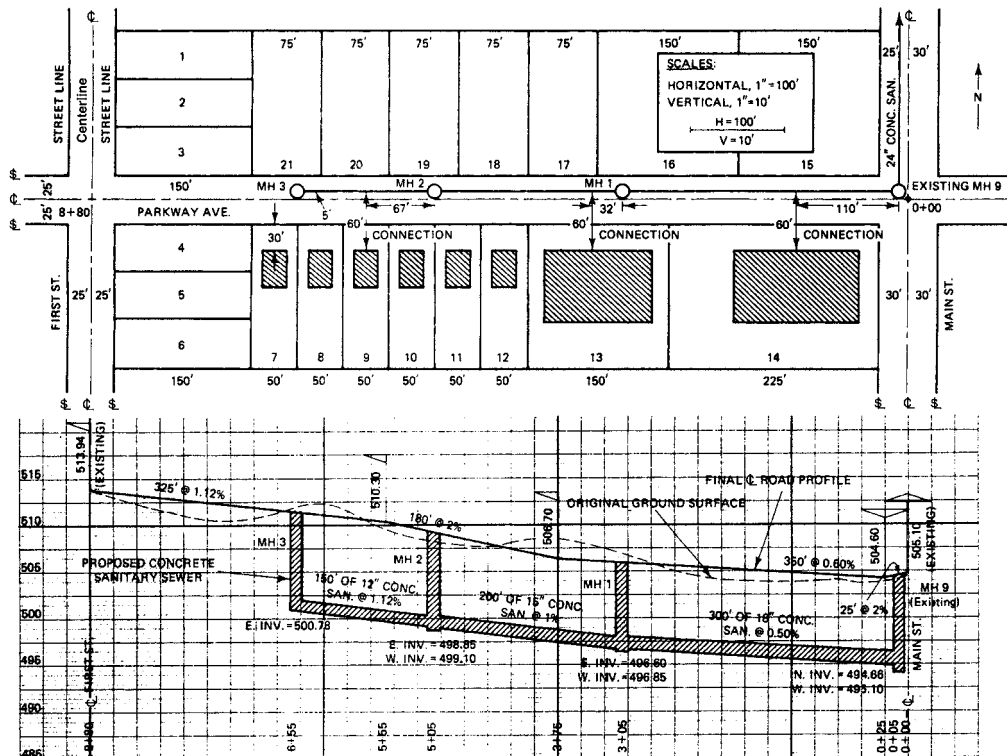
Plan and profile of Parkway Avenue (foot units). See also Figure 13.17.
